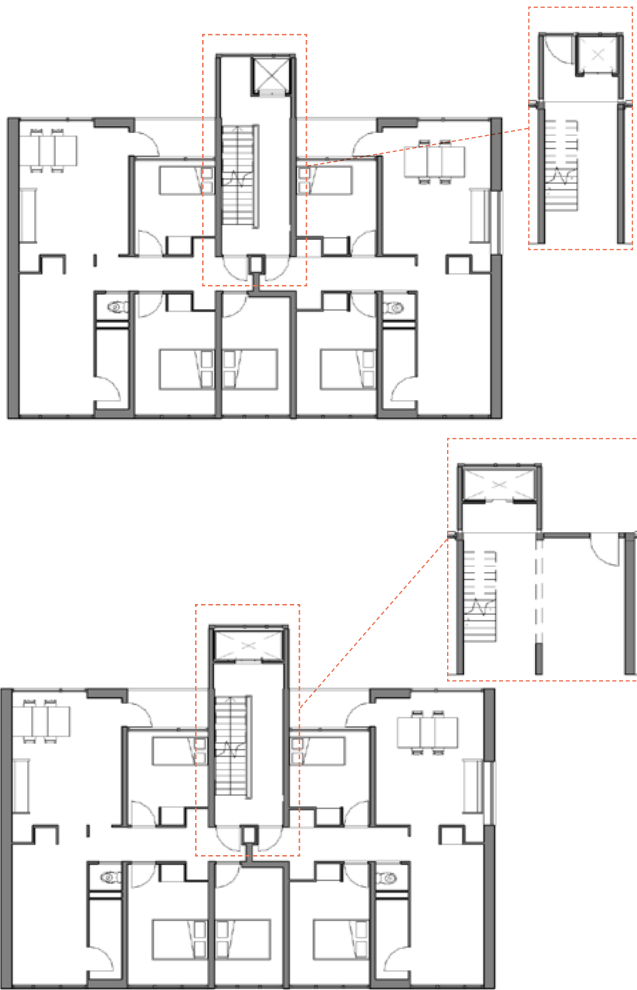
Floor plans showing 2 alternatives for approach 1
